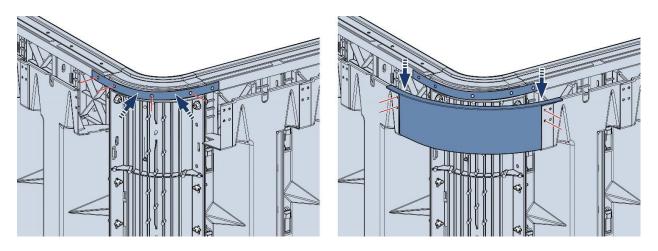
Placement of corner stiffeners and corner chaining forms (ovoid pools only)
